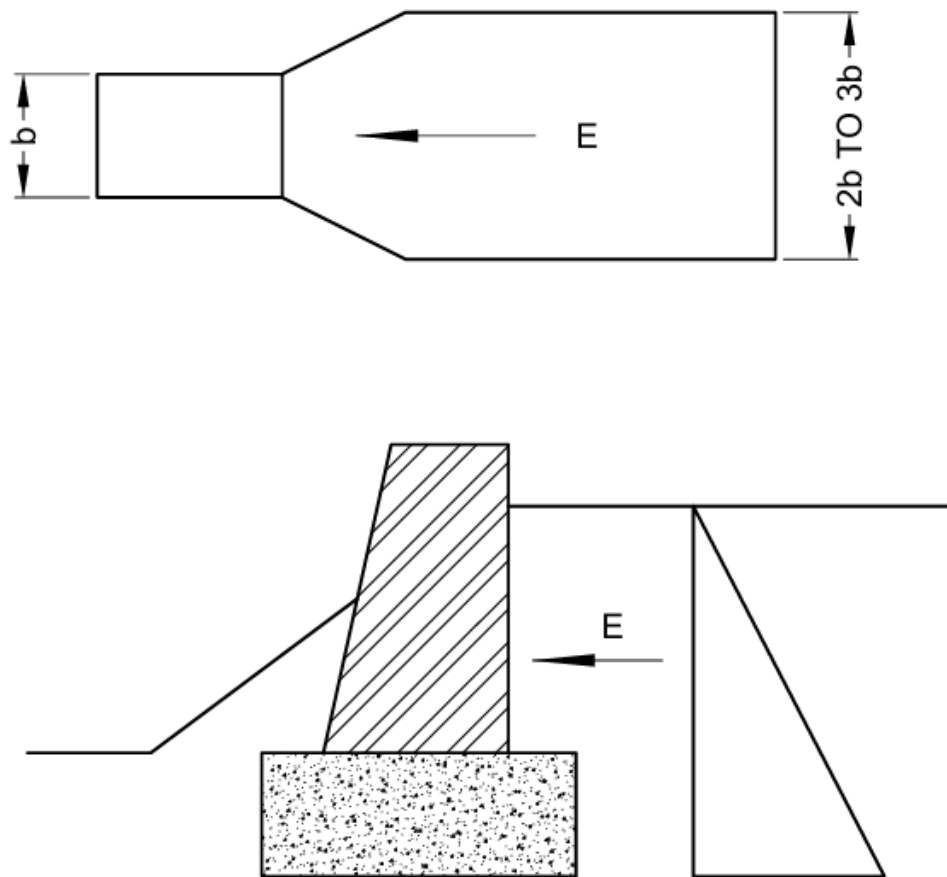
SKETCH SHOWING EFFECTIVE WIDTH OF PILLAR FOR CALCULATING SOIL PRESSURE
